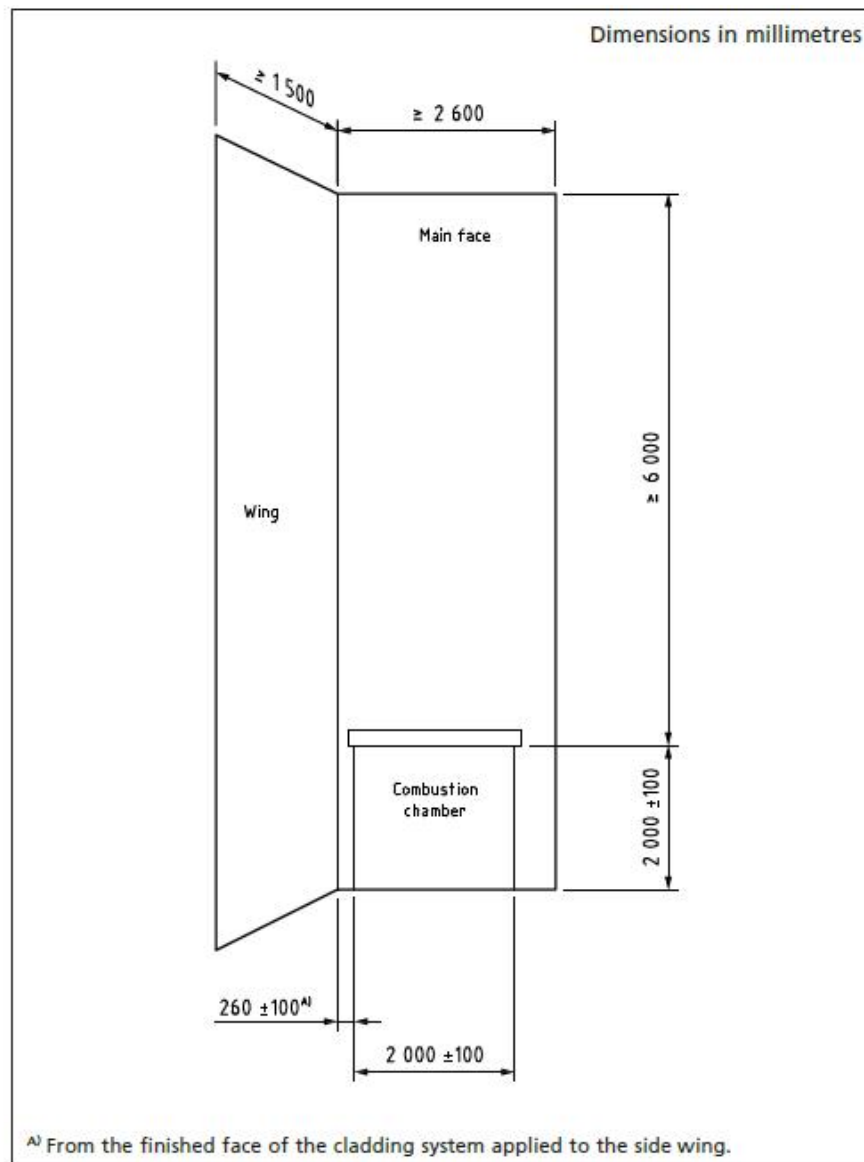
Test apparatus dimensions as specified by test Standard<sup>[1]</sup>.
